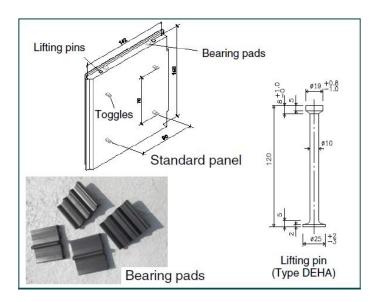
Elements of the concrete panel facing (Maccaferri, 2010)
